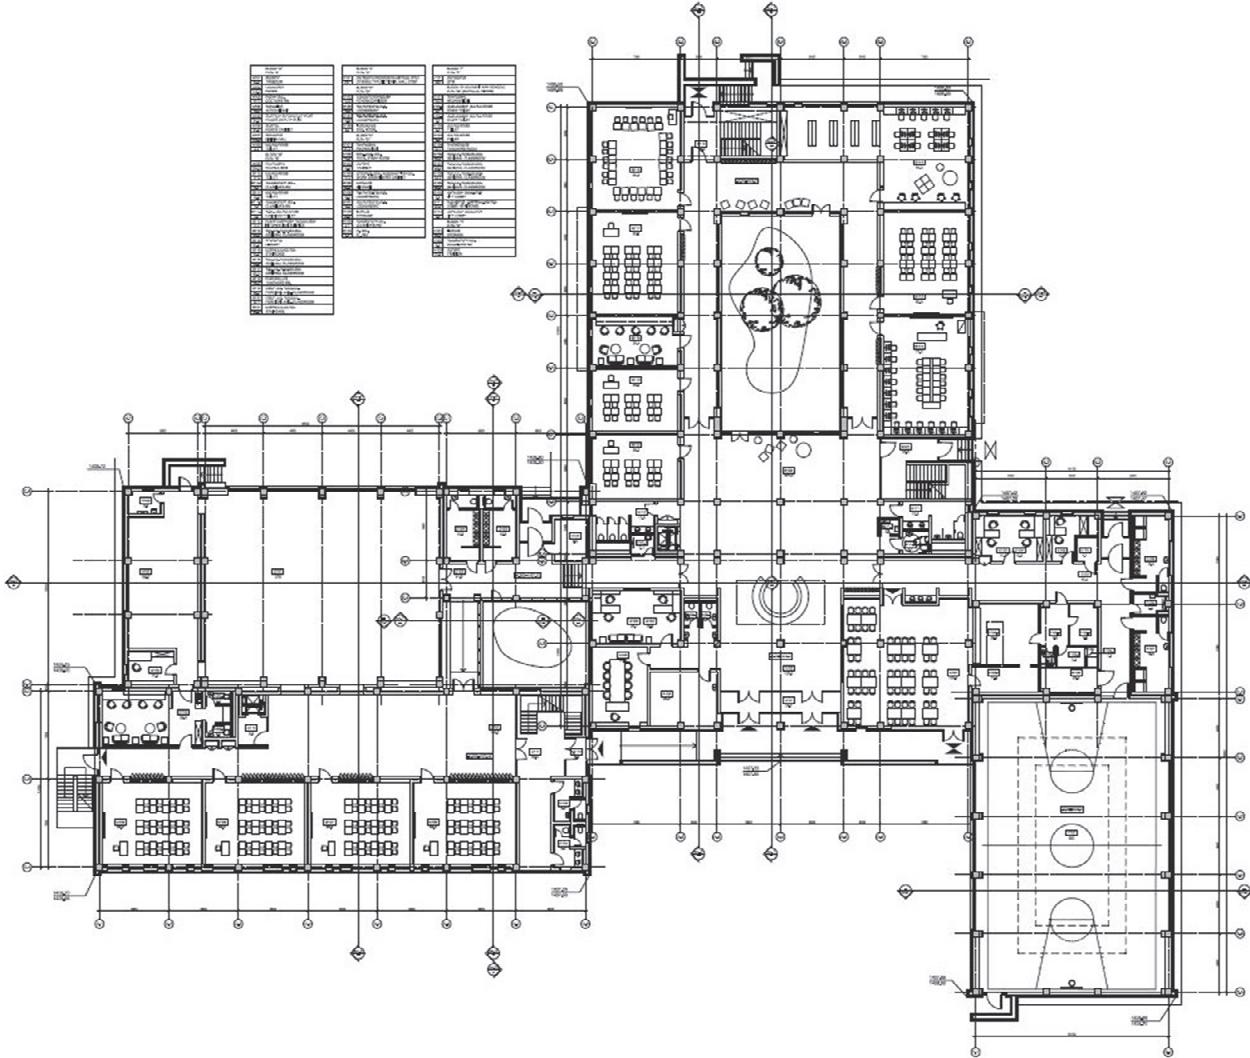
Ground floor plan of UNDP prototypical model school.
